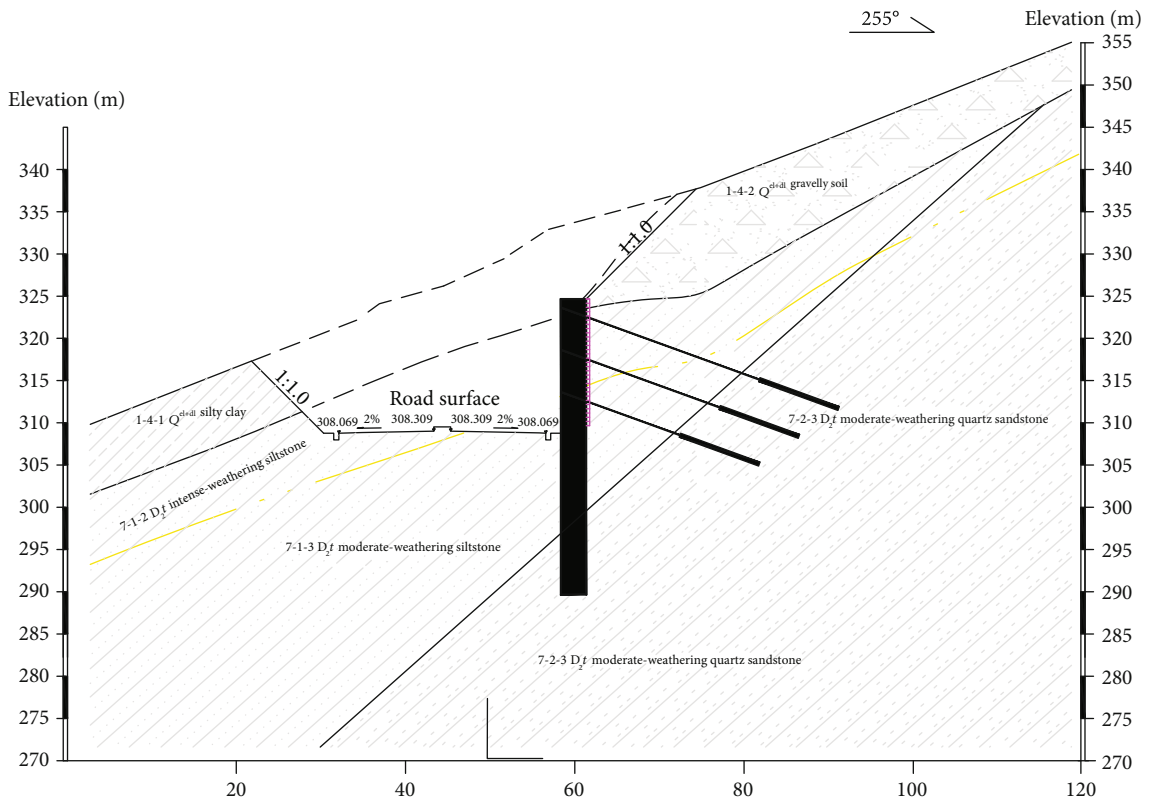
Engineering geology cross-section profile with reinforcement work of the cut slope (B-B').
